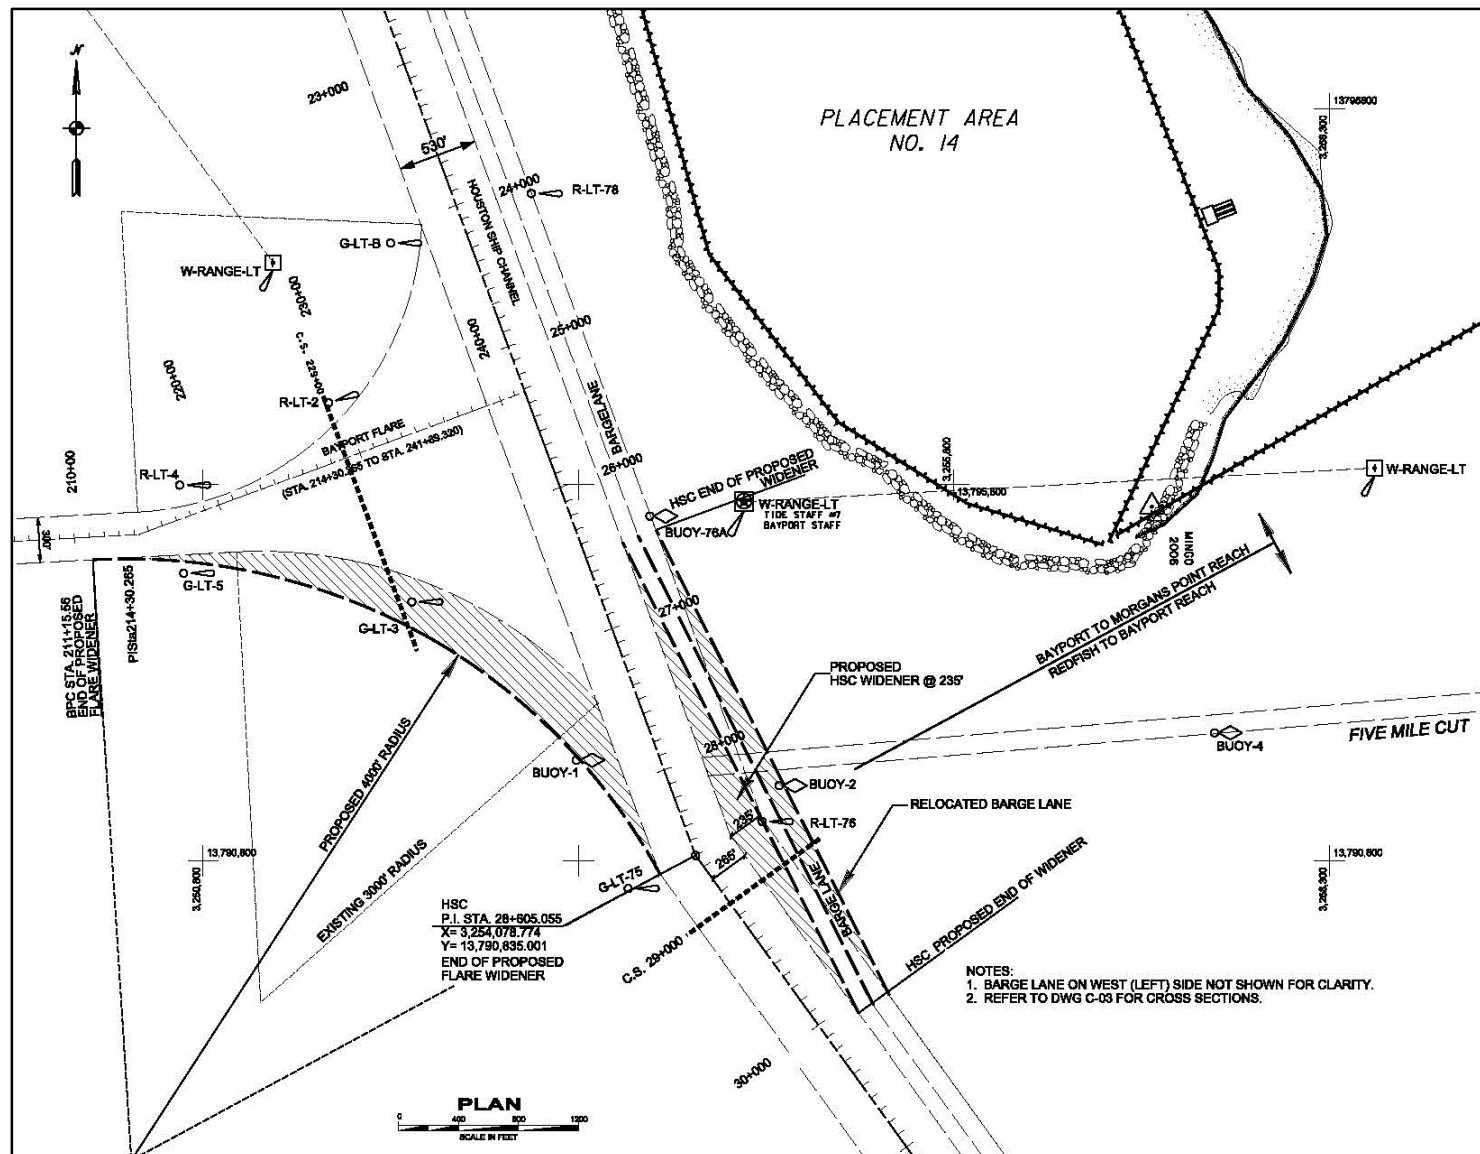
Plate C-02, Flare and HSC New Work Dredging Plan
